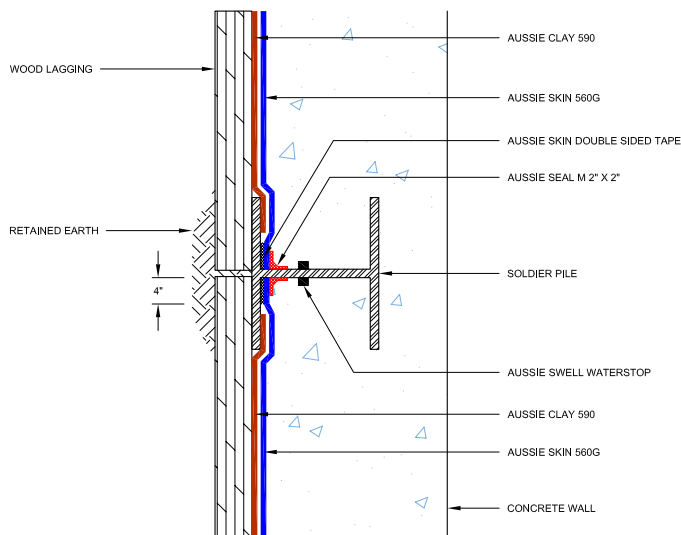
DUAL LAYER BACK LAGGED SOLDIER PILE
